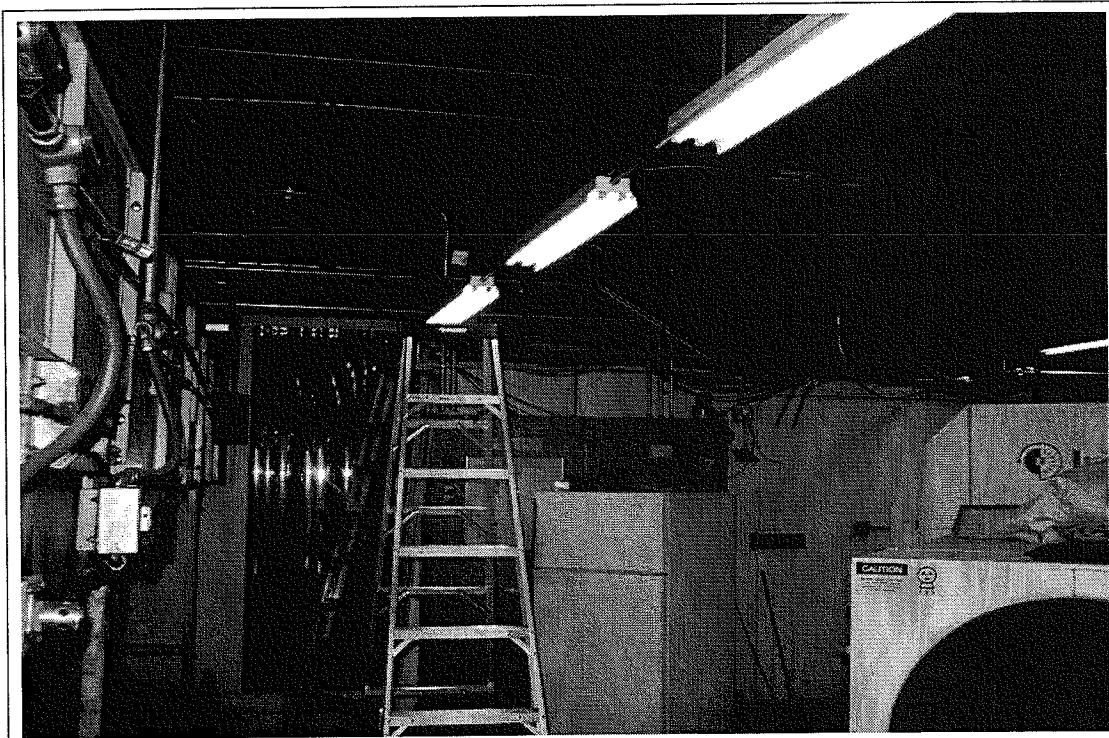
Location of dust sample # 2 (top of fluorescent light fixture) – West Baggage Handling area (FS2)
